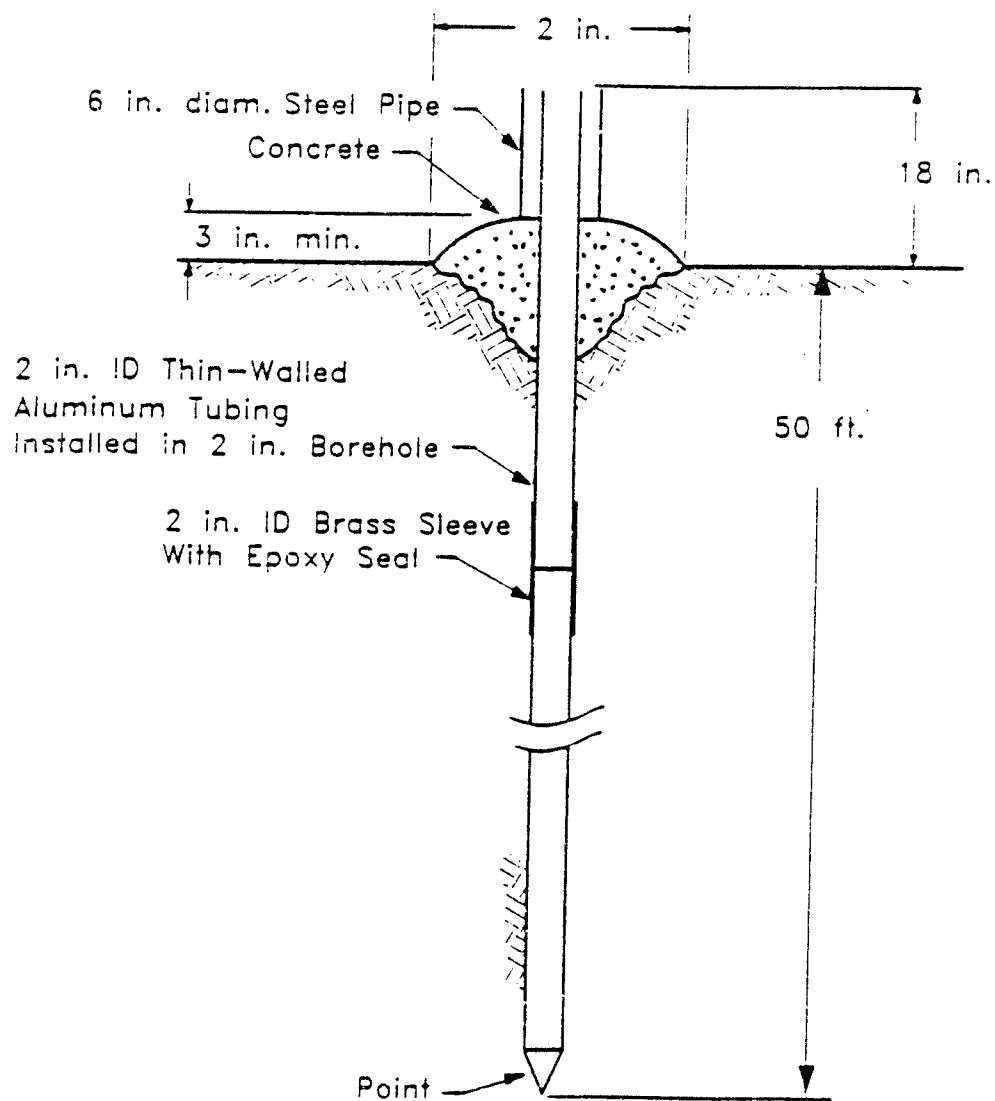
Schematic Drawing of Neutron Access Tube Design and Installation.
